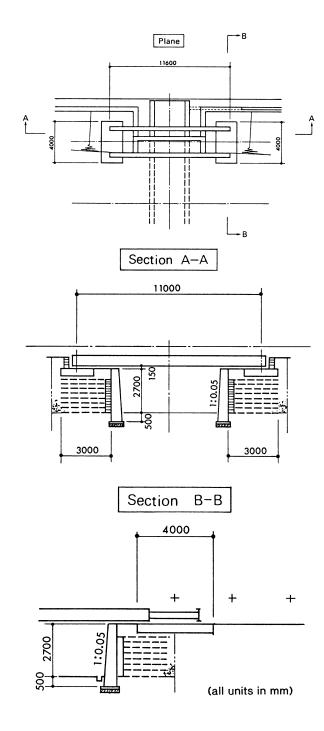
Plan and cross-section of geogrid-reinforced retaining wall bridge abutments (Kanazawa et al. 1992)
